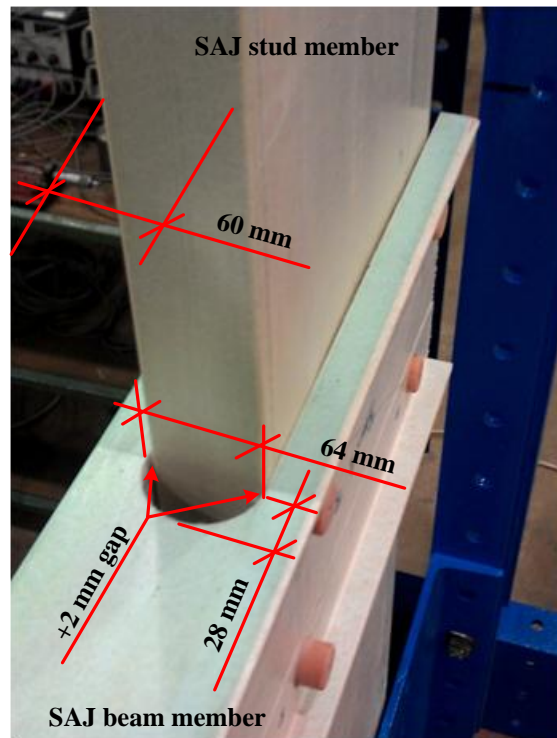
Startlink frame joint viewed from top flange of floor beam.
